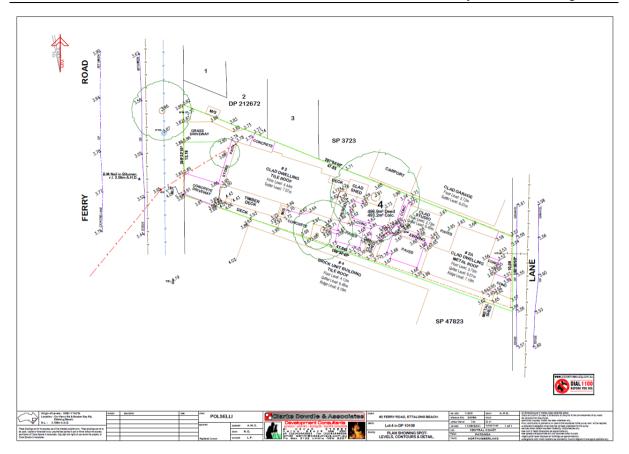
Extract from Site Survey Plan (courtesy of Clarke Dowdle & Associates)
